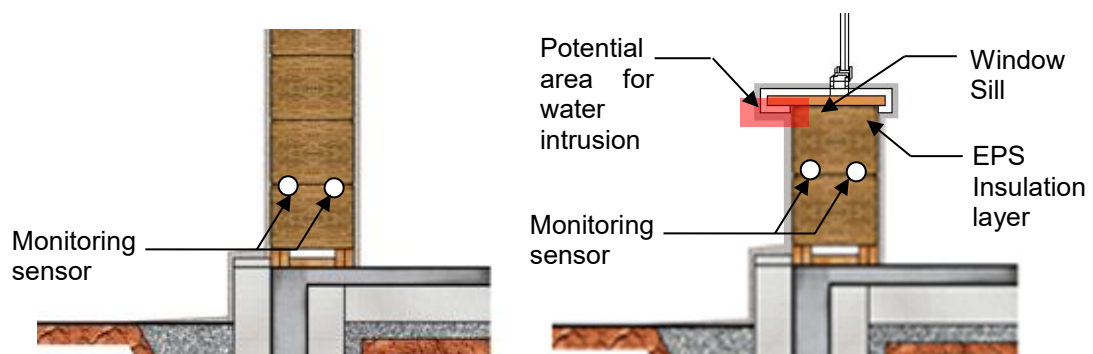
Walling construction of the straight walling (left) and the walling around window opening (right).
